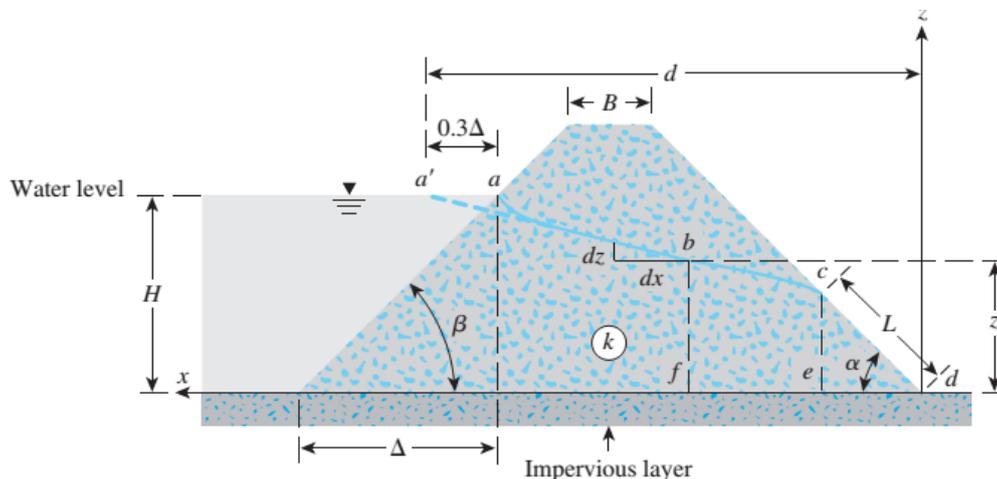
Flow through an embankment constructed over an impervious base (Principles of Geotechnical Engineering, BM Das)
